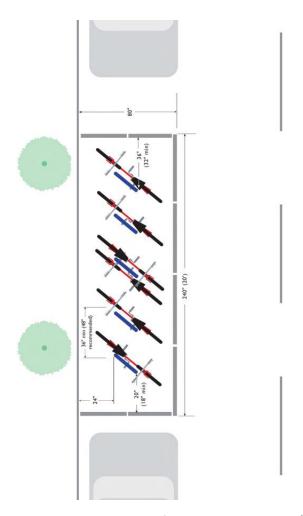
Typical Layout of a Bike Parking Corral (Source: APBP2)
